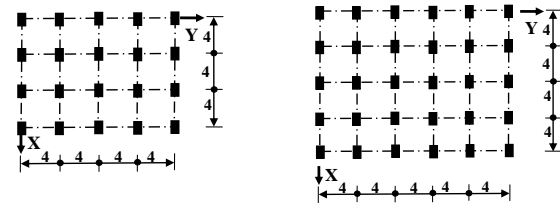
Plan of 5 storey(left) and 10 storey (right) buildings
